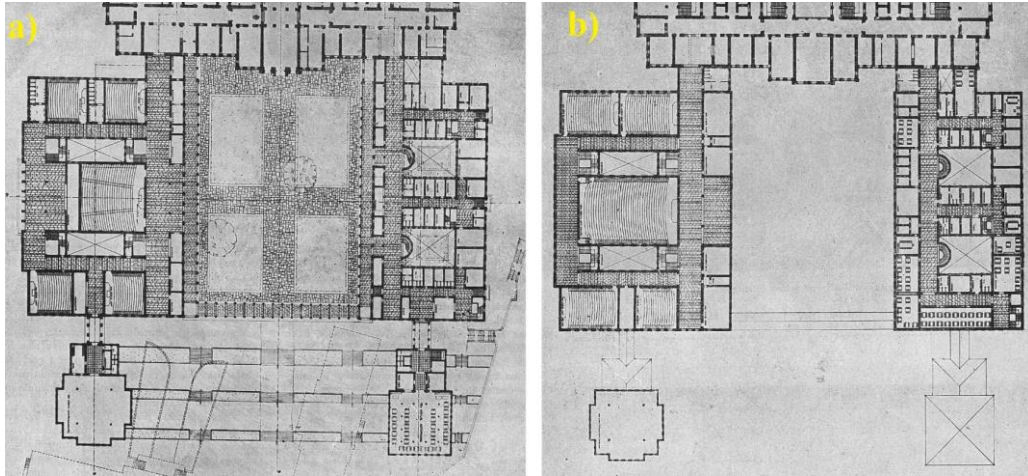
The project that was selected first in the competition for Istanbul University Faculty of Law and Economics Buildings, the plan drawings submitted at the submission of the competition [12], a) ground-floor plan, b) first-floor plan
